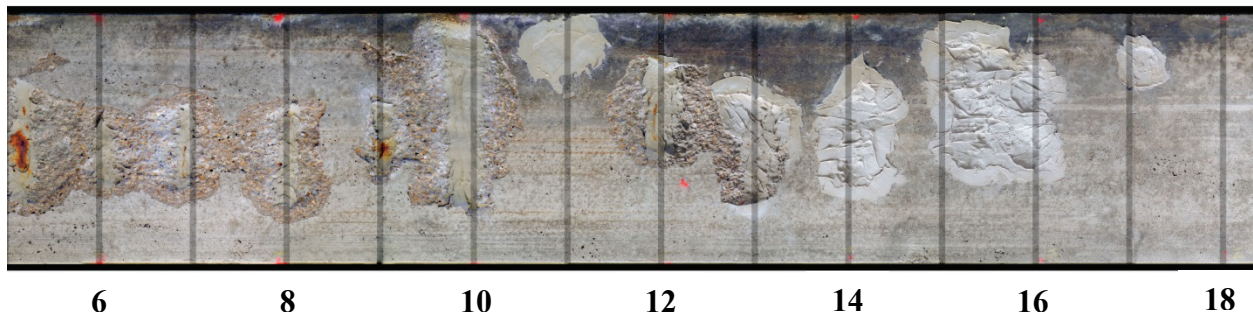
Typical intermediate span spalling, Oyster Creek - Span 2 - Slab 4
